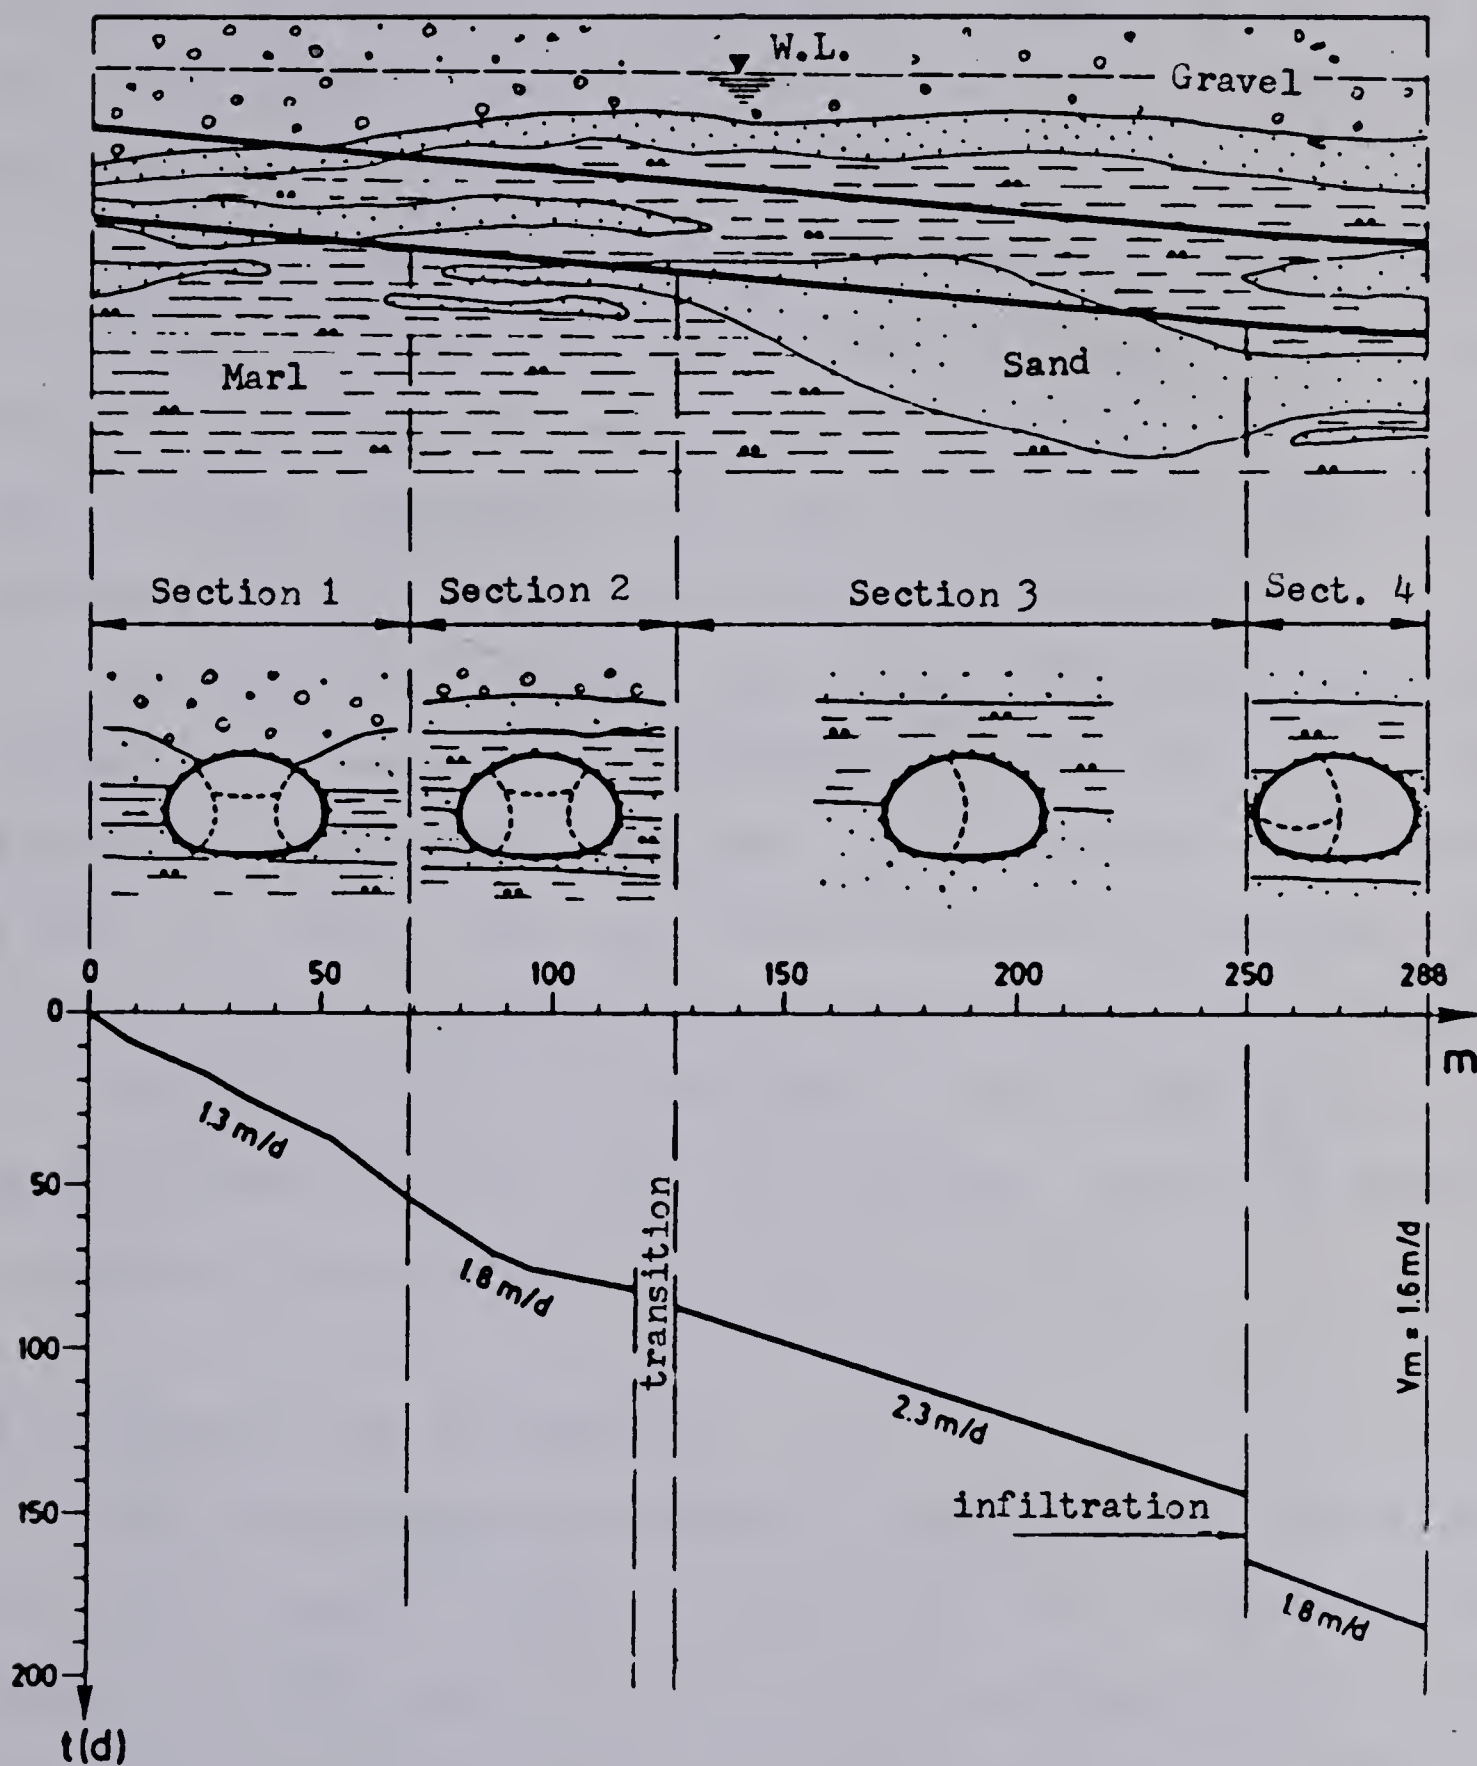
Schemes of excavation used in a tunnel in Munich
